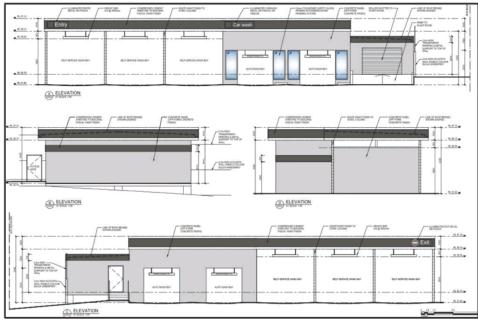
Elevations new car wash (Source: MCHP Architects, Drawing No. 19-085 DA03 Rev B)
